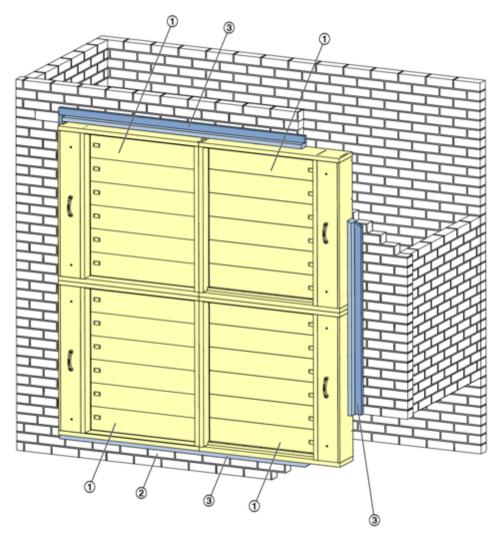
Dry mortarless installation on solid wall or solid shaft wall EI 120 S v_{edw} - Multiple occupancy of the installation opening
